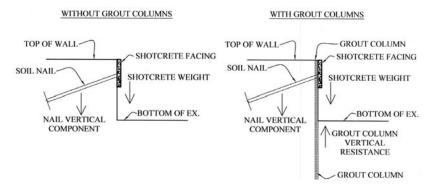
Vertical Forces With and Without Grout Columns during Soil Nail Construction
